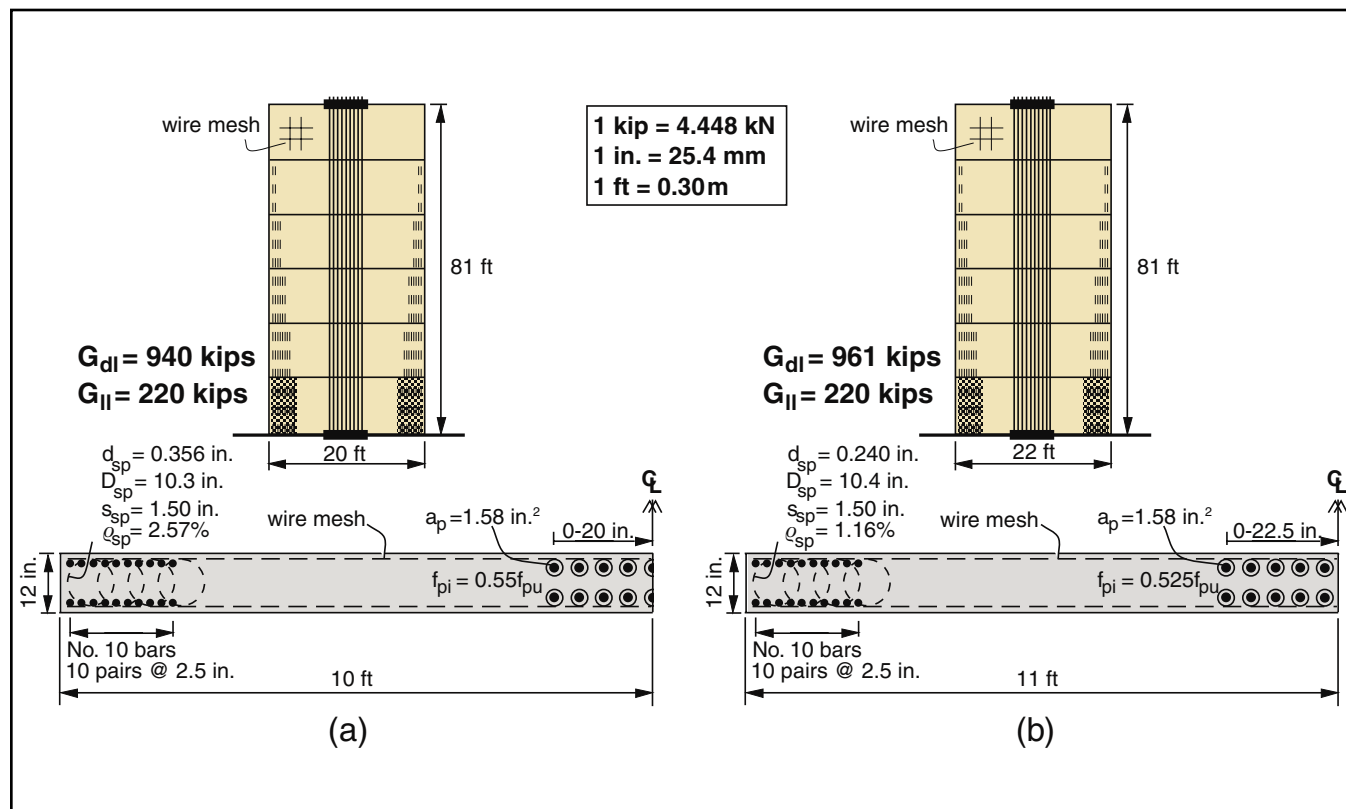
Prototype walls: (a) Wall PP6-BO; (b) Wall PP6-EO.
